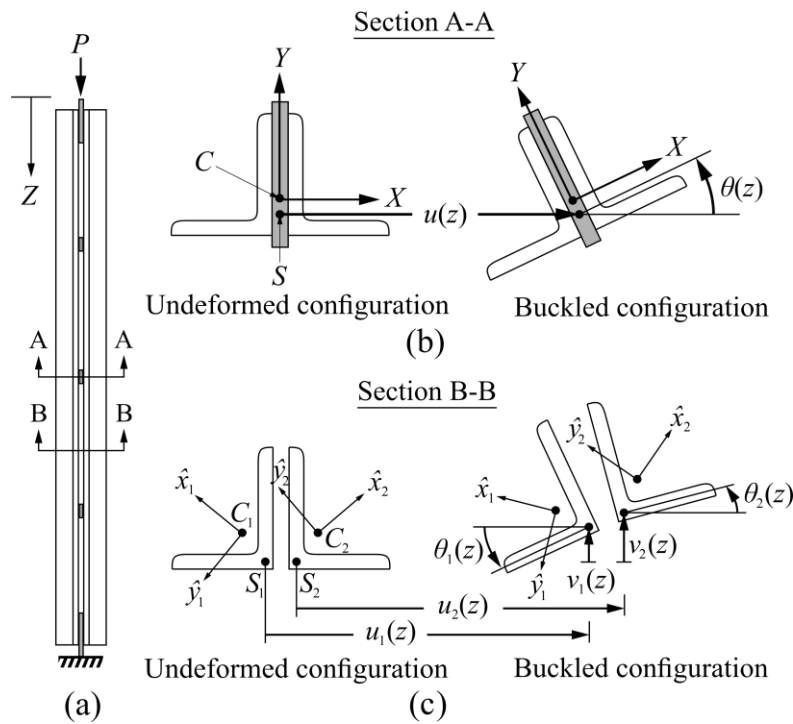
Compression assembly made of closely spaced back-to-back double angles with interconnectors (a) Elevation view, (b) Cross-sectional view A-A at interconnector, (c) Cross-sectional view B-B away from interconnectors.
